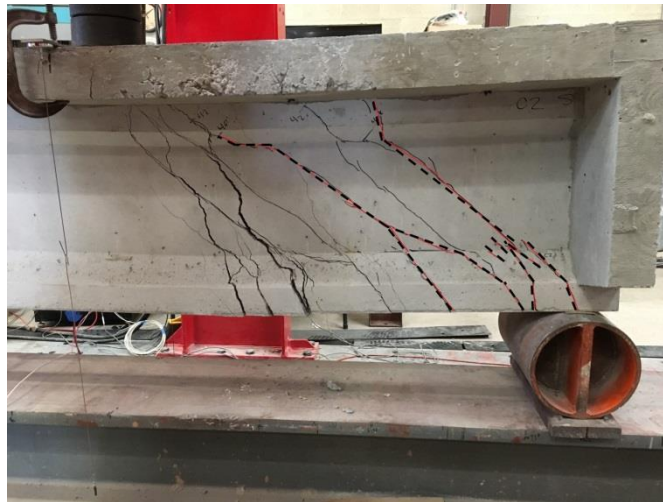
Girder C2s cracking (initial shear cracks highlighted)
